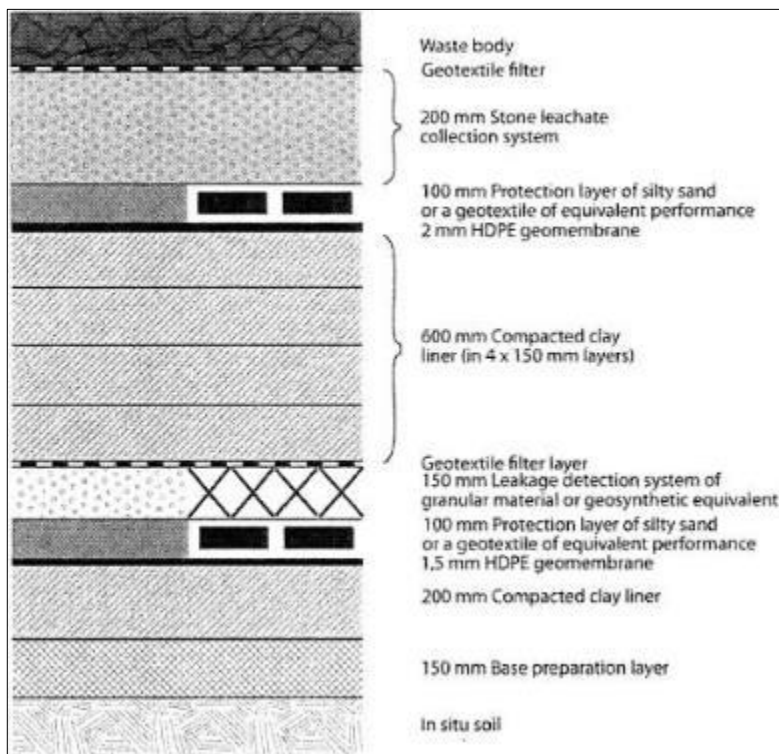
Minimum Engineering Design Requirements for Class A Landfill Site (South Africa, GN R. 636 norms and standards)
